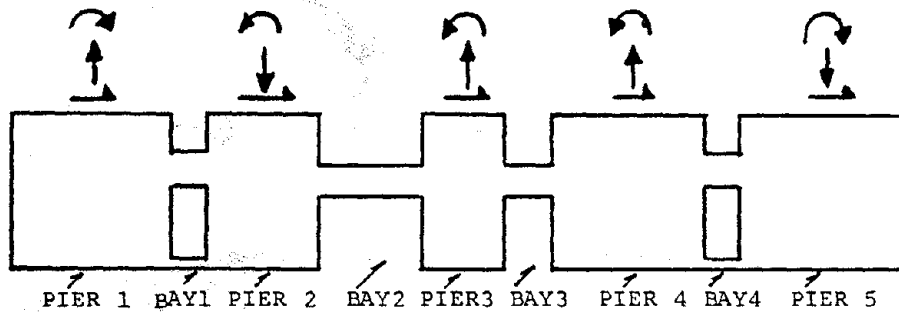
FINITE ELEMENT SUB-STRUCTURE
